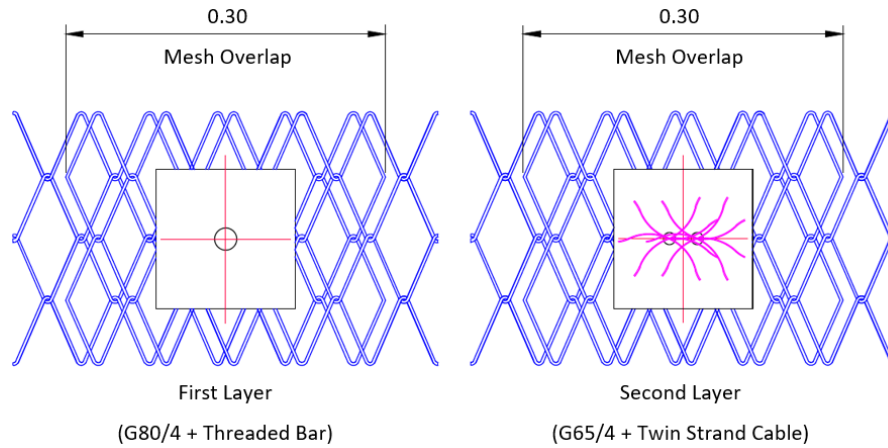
Detailed view of mesh overlap arrangement for the first and second ground support layers.
